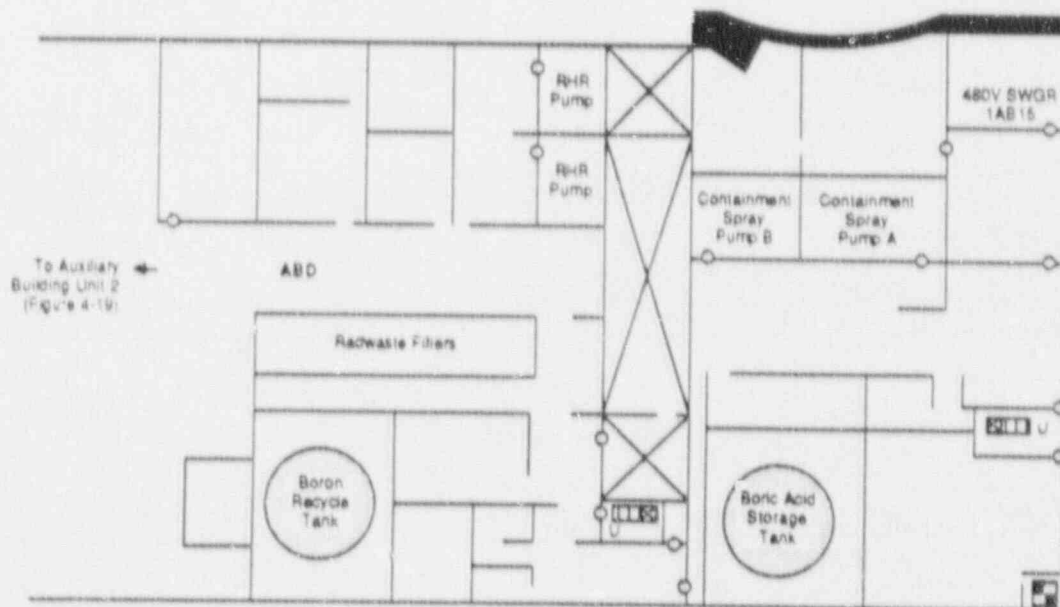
Vogtle 1 Auxiliary Building, Level D (Elevation 119'-3" to 143'-6")
